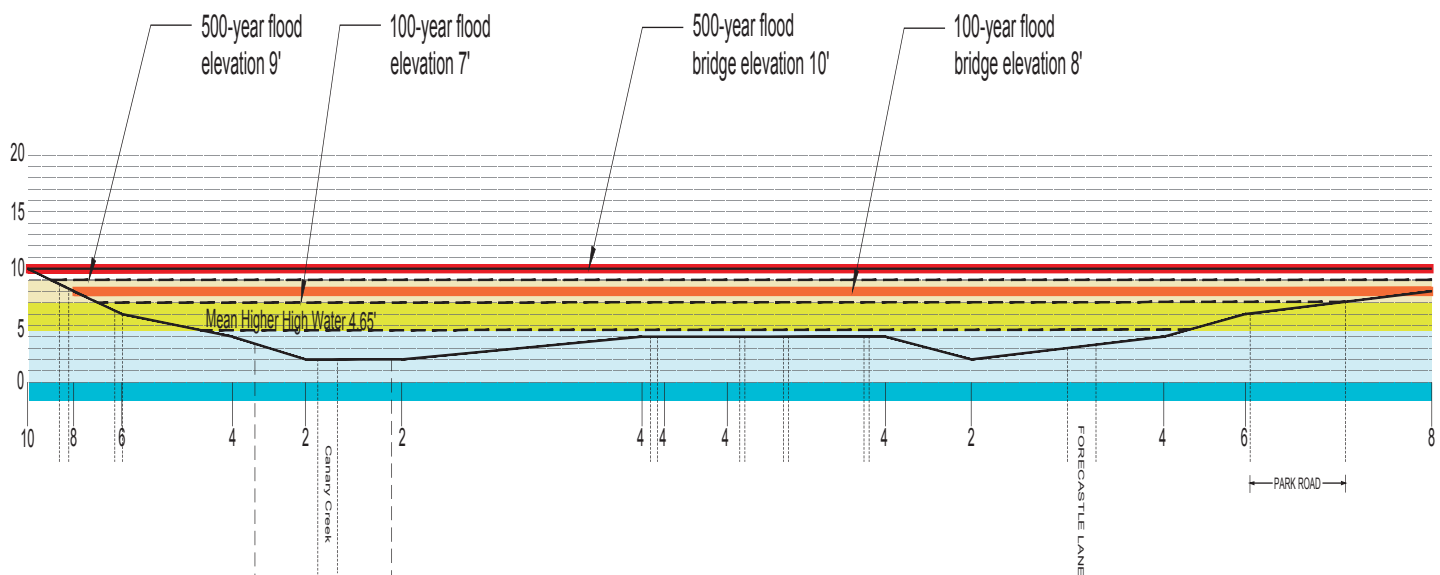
Bridge elevations in relationship to current and projected 100-year flood elevations (elevations shown are one-foot above estimated flood elevation)
